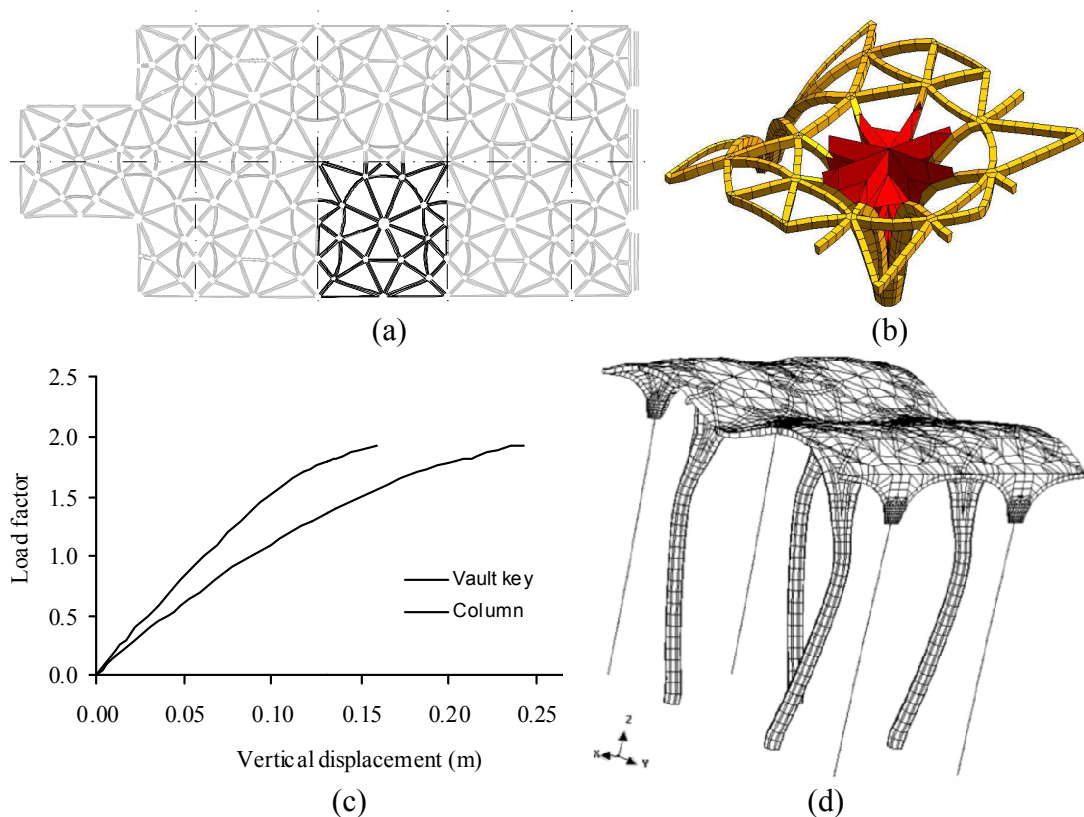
Detailed model of the church for vertical loading: (a) church plan and basic plan; (b) details around capital; (c) load-displacement diagram; (d) incremental deformed mesh at failure
